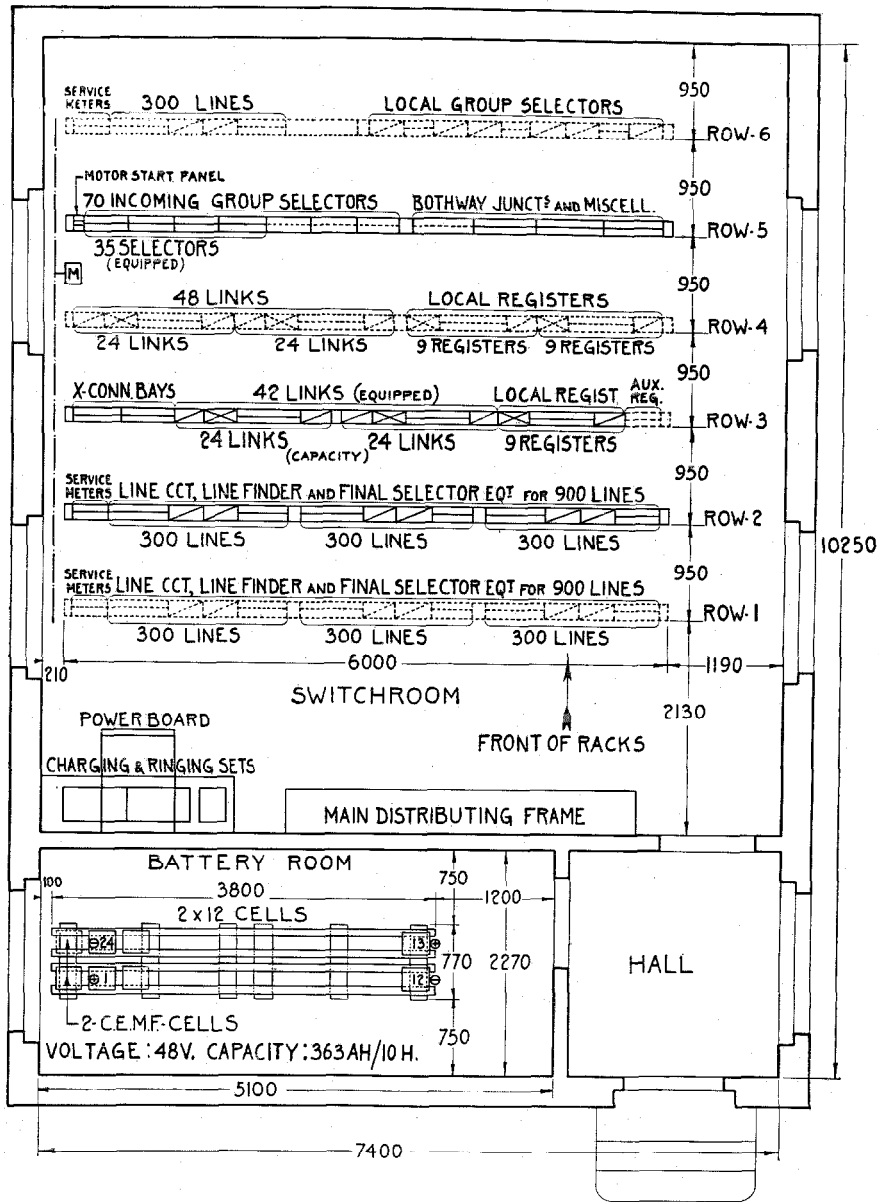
Floor Plan Small Centre Exchange—300 Lines Capacity.
